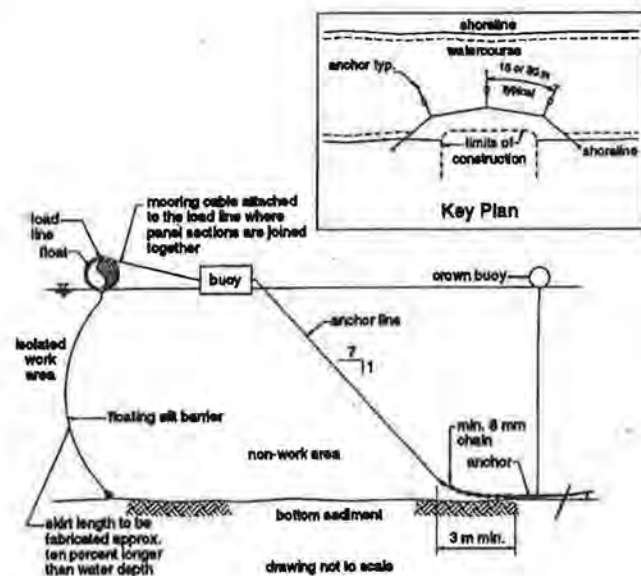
Typical floating silt barrier anchorage system using marine anchors
